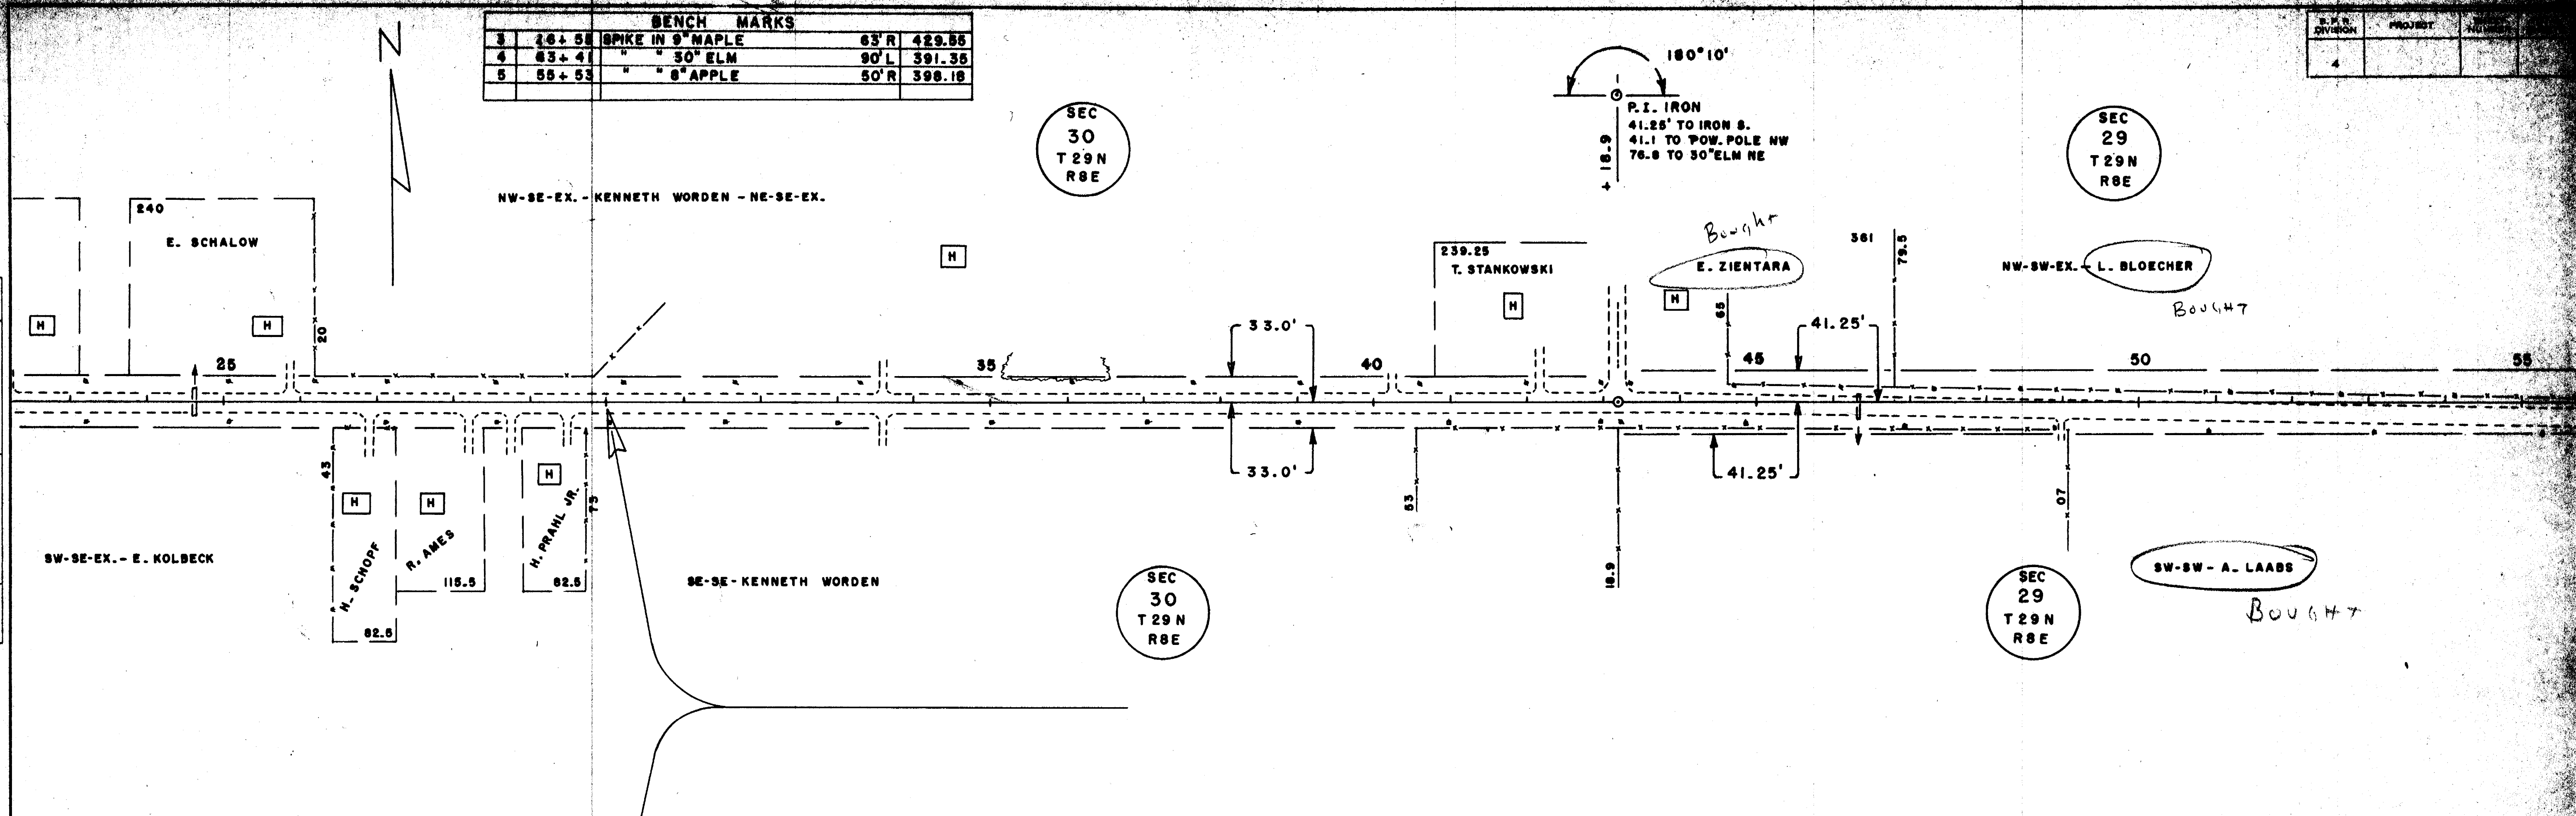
PLAN PROFILE S.P.R. STANDARD
